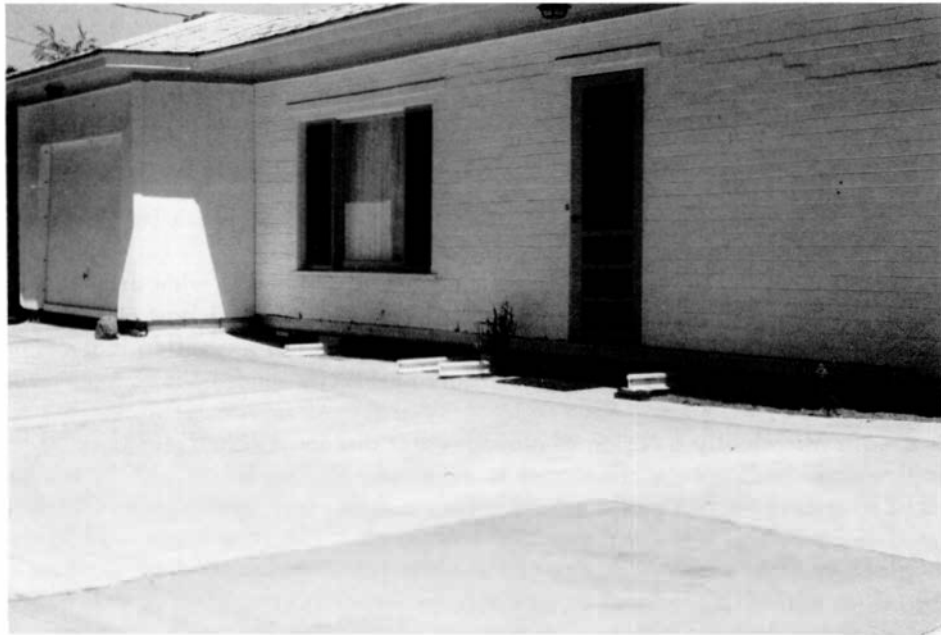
House in The Dalles placed on tracks to minimize structural damage due to sliding.
